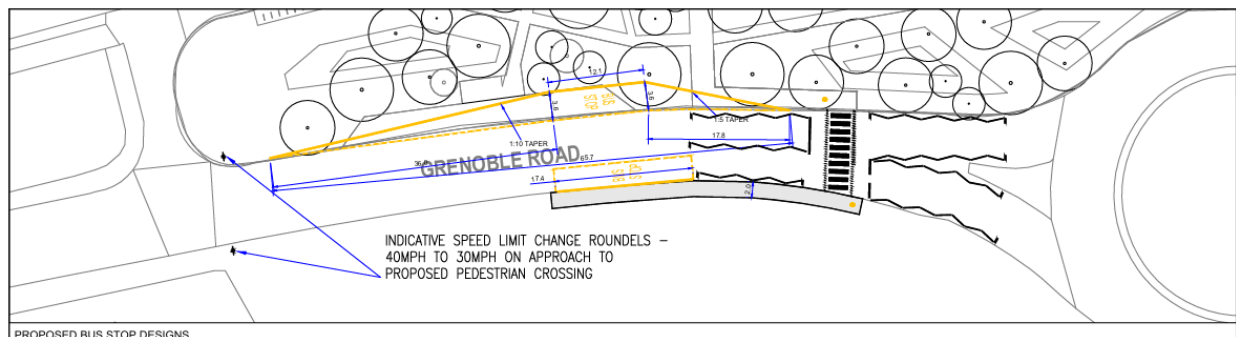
Location of proposed bus stops and zebra crossing in relation to the Grenoble Road roundabout.
